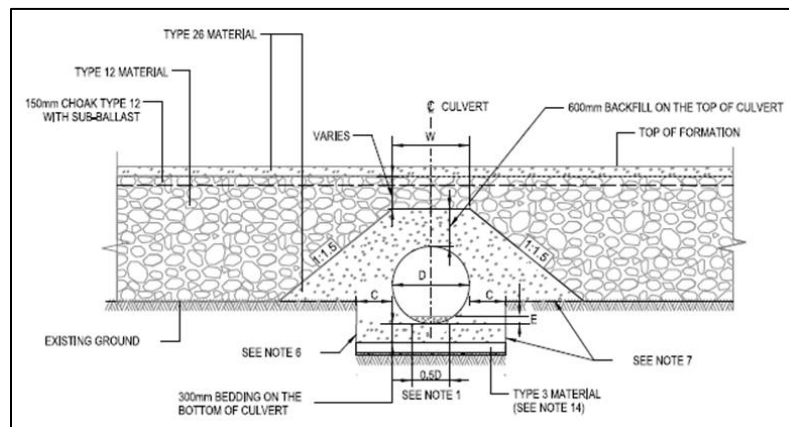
Single Pipe Culvert with Minimum Backfill Requirements
